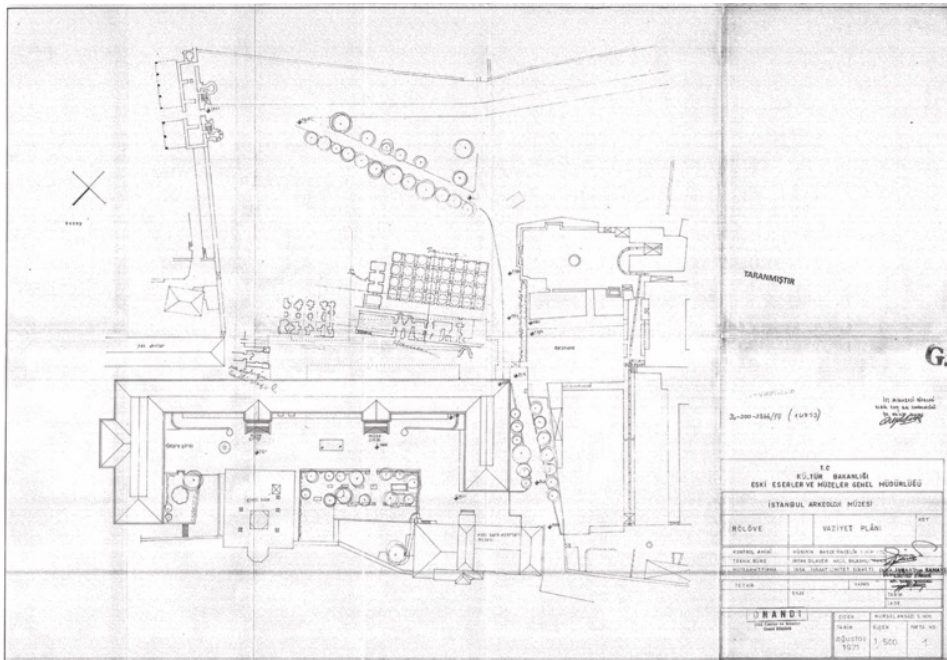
Site plan of Additional Building of IAM dated to 1971 (source: ICCCH-Archive)
